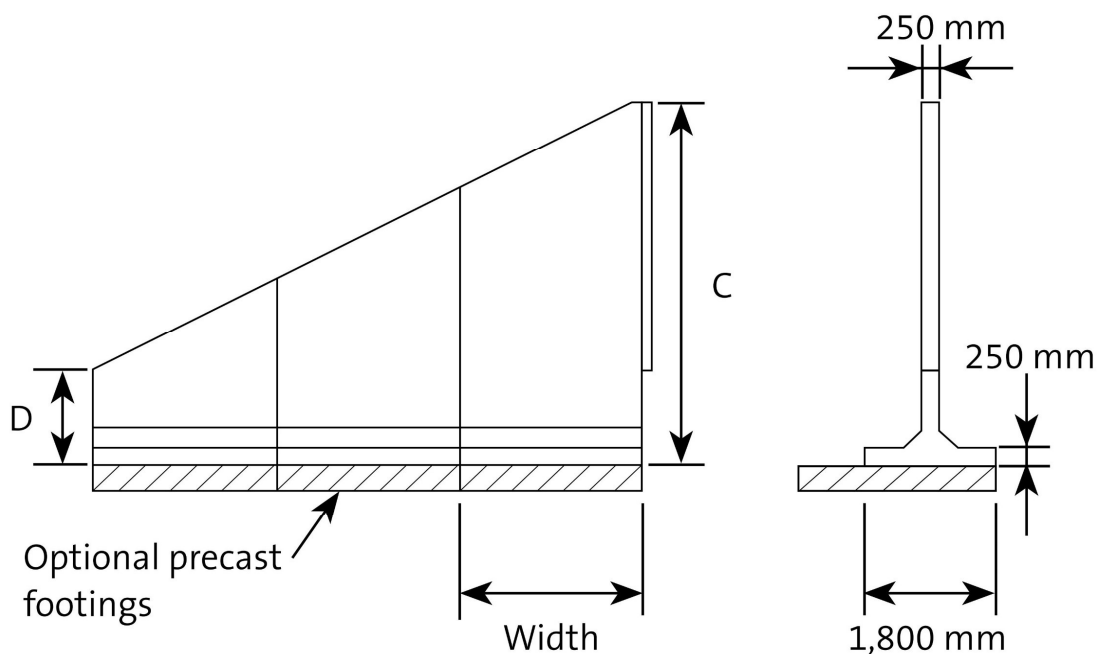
Wingwall elevation and cross-section reproduced courtesy of Humes.
